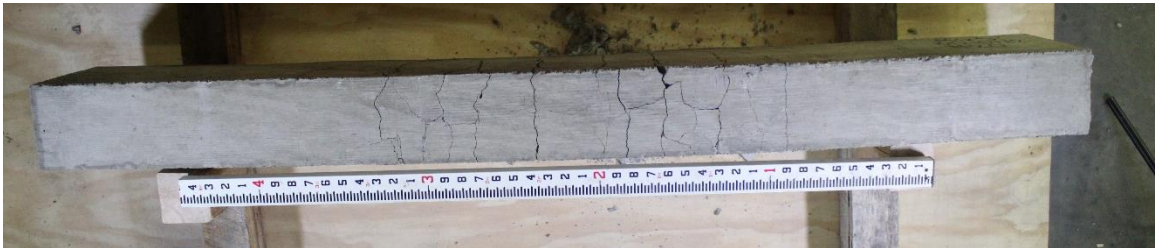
Mixture 5 (10Q10FA2) beam #20: concrete beam bottom view.
